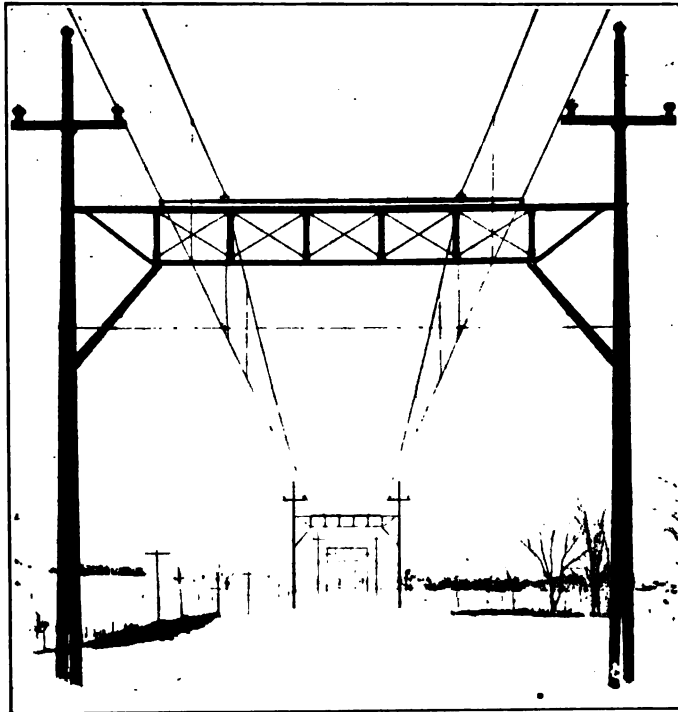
Light bridge construction on Rochester, Syracuse & Eastern railway
